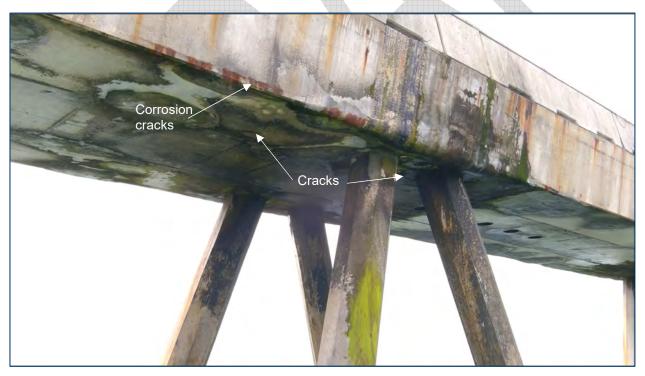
Deck Exterior at Bent 1K – North Face
